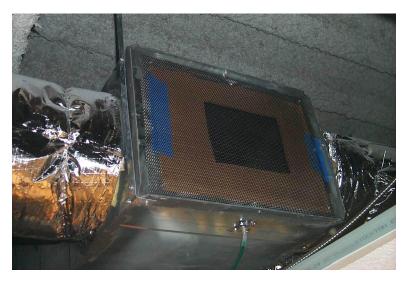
Example of an installed downstream leak at the end of a plenum. Ducts can be seen exiting two sides of the plenum. A static pressure sensor is mounted adjacent to the installed leak.
